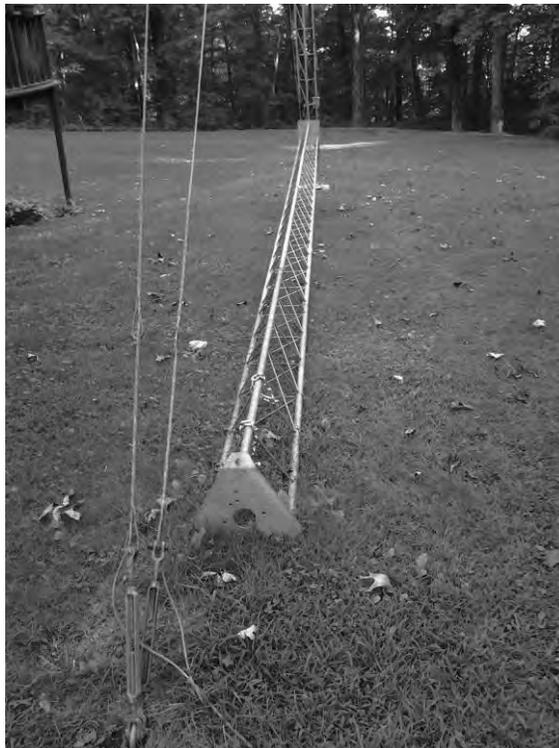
CHAIN USED TO ATTACH HOISTING MAST TO TOWER GUYS
